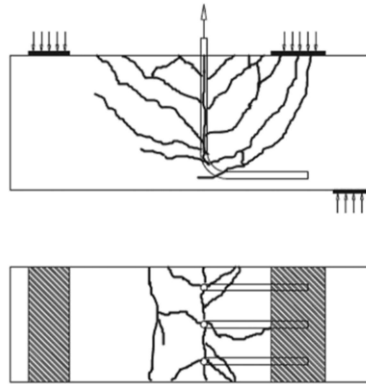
Cracking pattern near anchorage failure reported by Ajaam et al. (2018)
